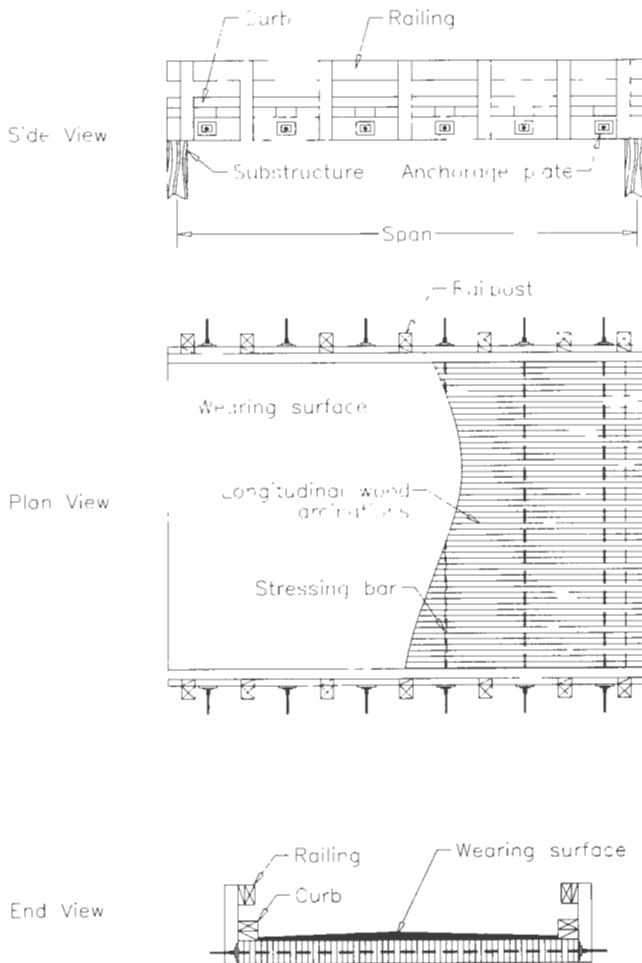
Typical configuration of stress-laminated timber deck bridge.
